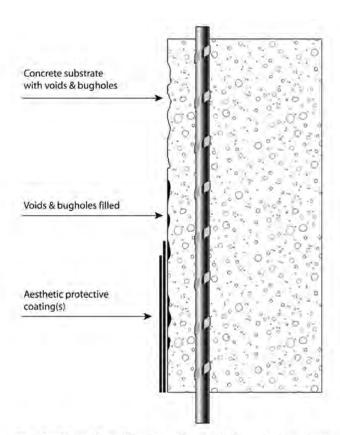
Through-wall section of a typical concrete surface to be leveled or profiled.
